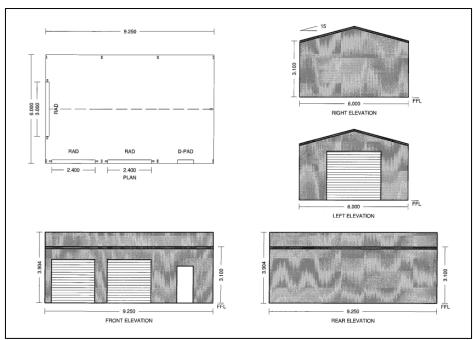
Proposed Shed (Ultra Steel Sheds & Garages)
